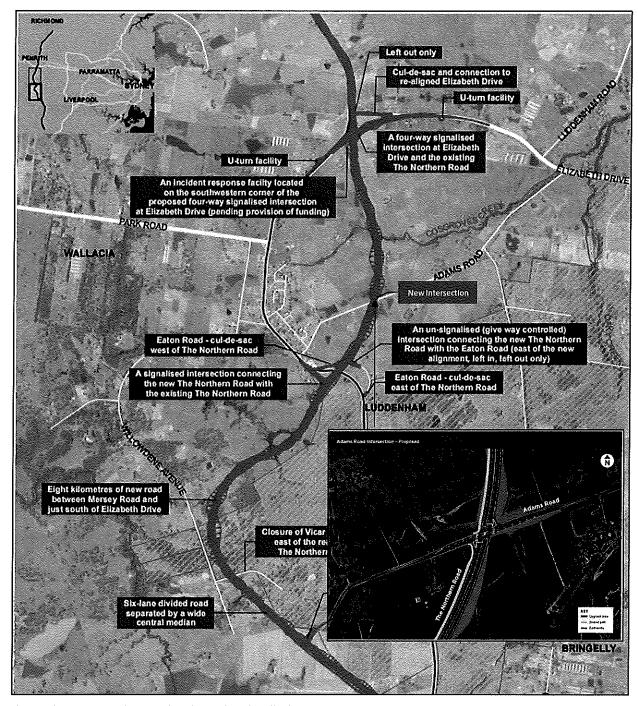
Proposed Intersection The Northern Road/ Adams Road
